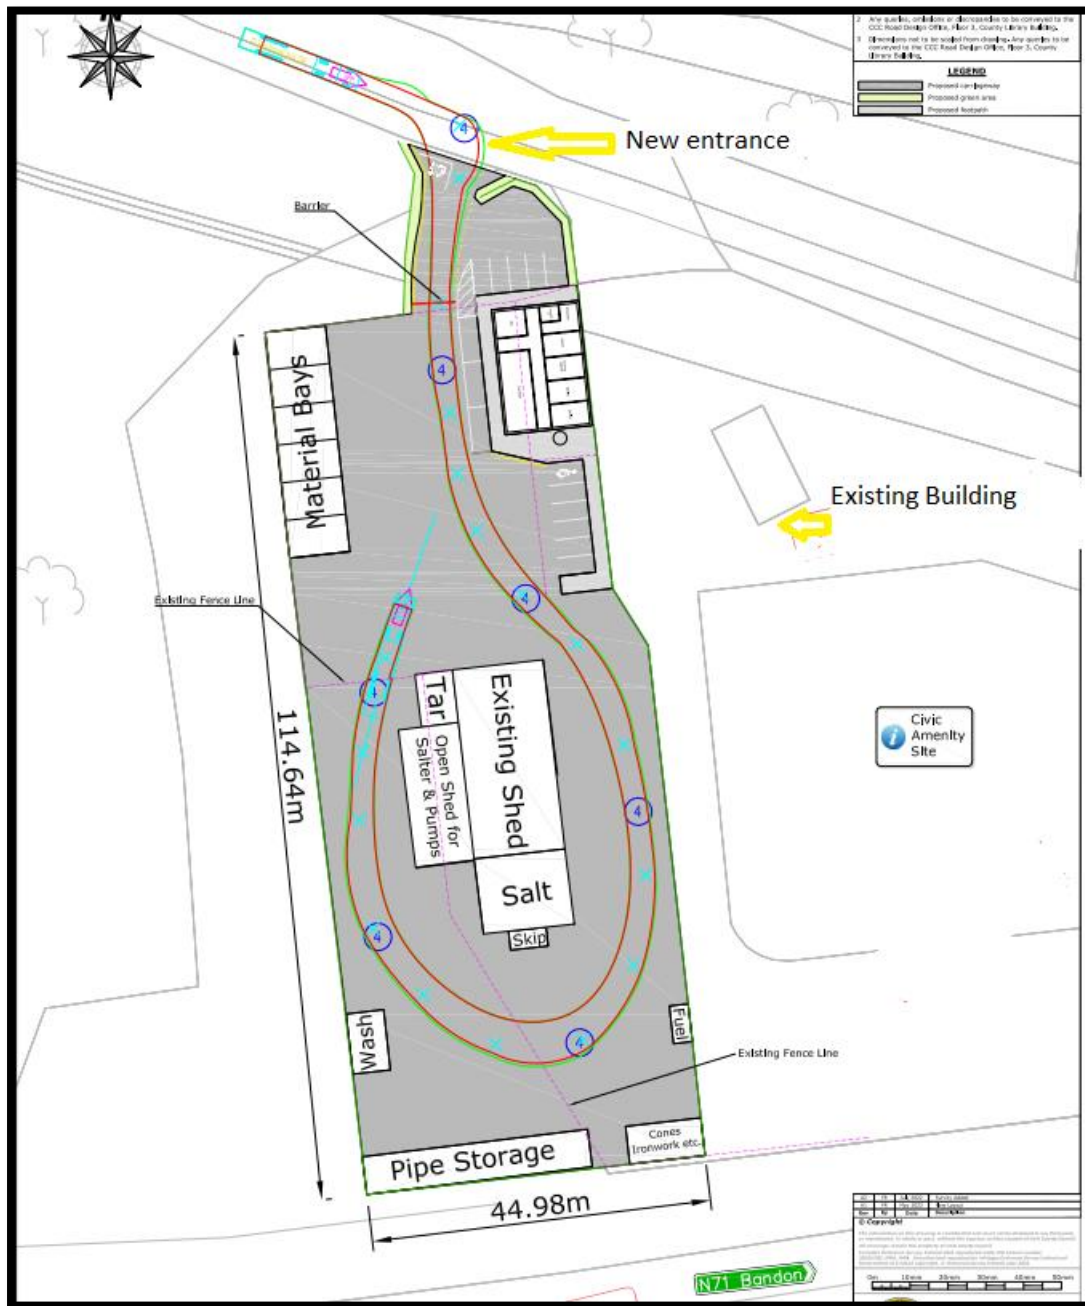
Proposed layout of the new depot showing existing buildings and fence lines.
